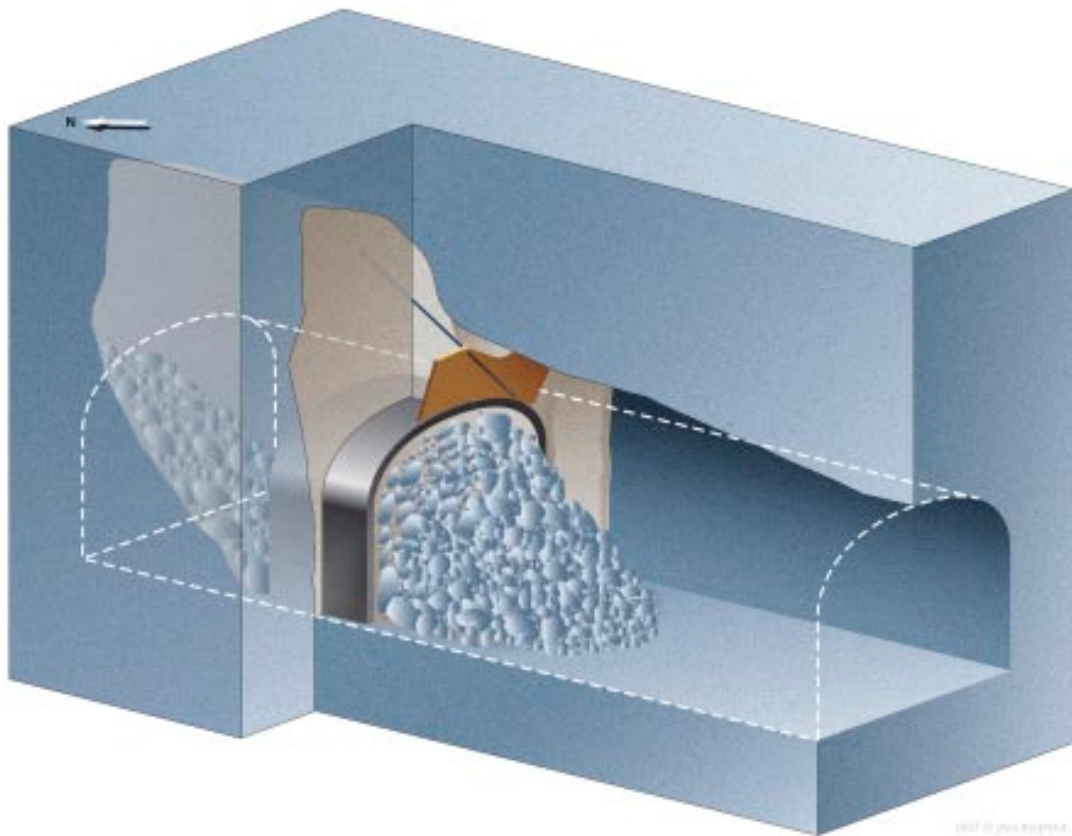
The method used to support section 2/545 in the Singö deformation zone, Forsmark 3 tunnel /modified after Carlsson and Larsson 1983/.
